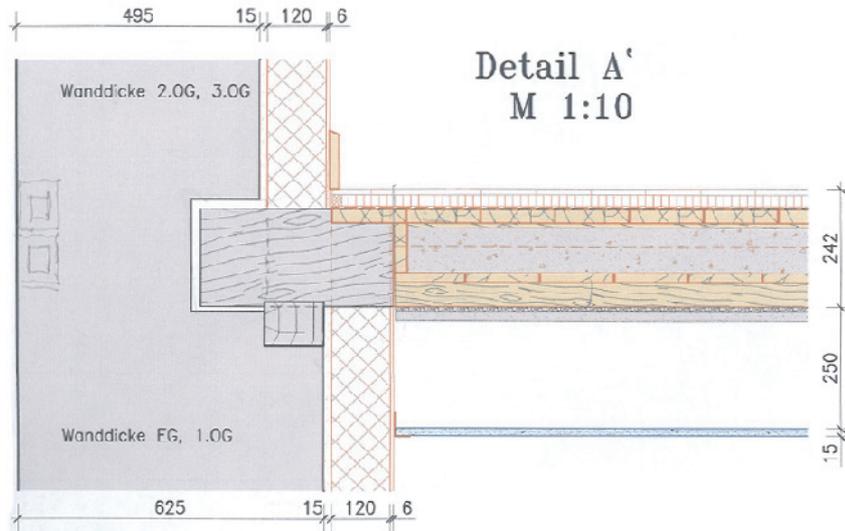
Connection of wooden floor beam and wall structure. An internal insulation of 120 mm was applied consisting of the developed light-weight AAC. Drawing according to [1]
